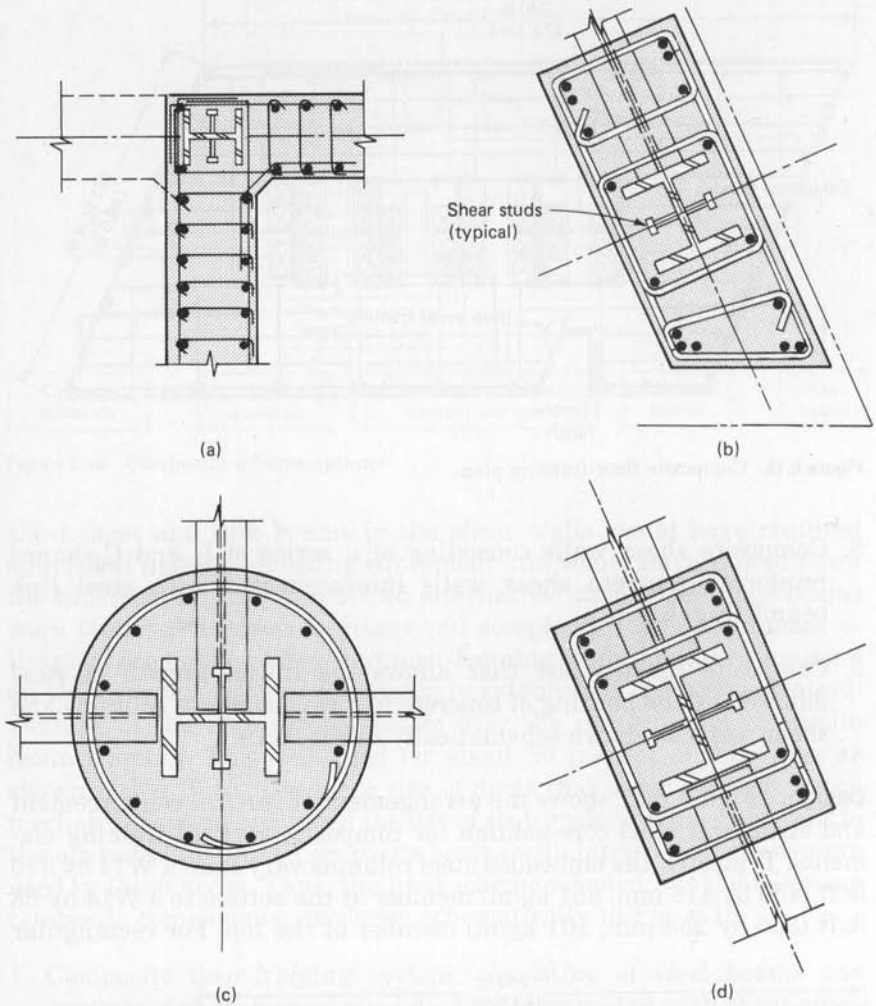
Composite vertical systems. (a) Composite shear wall; (b) composite corner column; (c) typical circular column on long faces; (d) typical exterior column on short faces.
